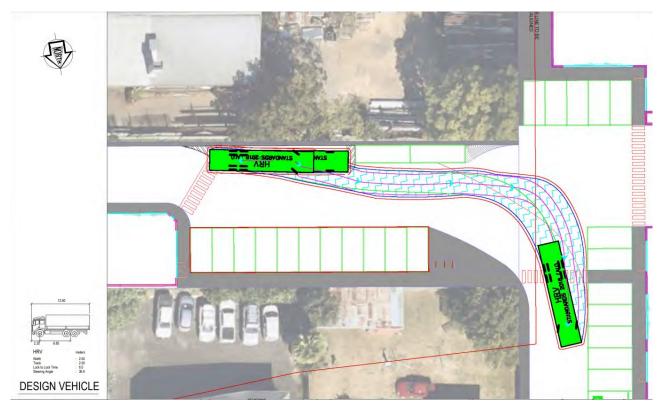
Albert Street Crossover - HRV Loading Zone 1 - Egress Movement
